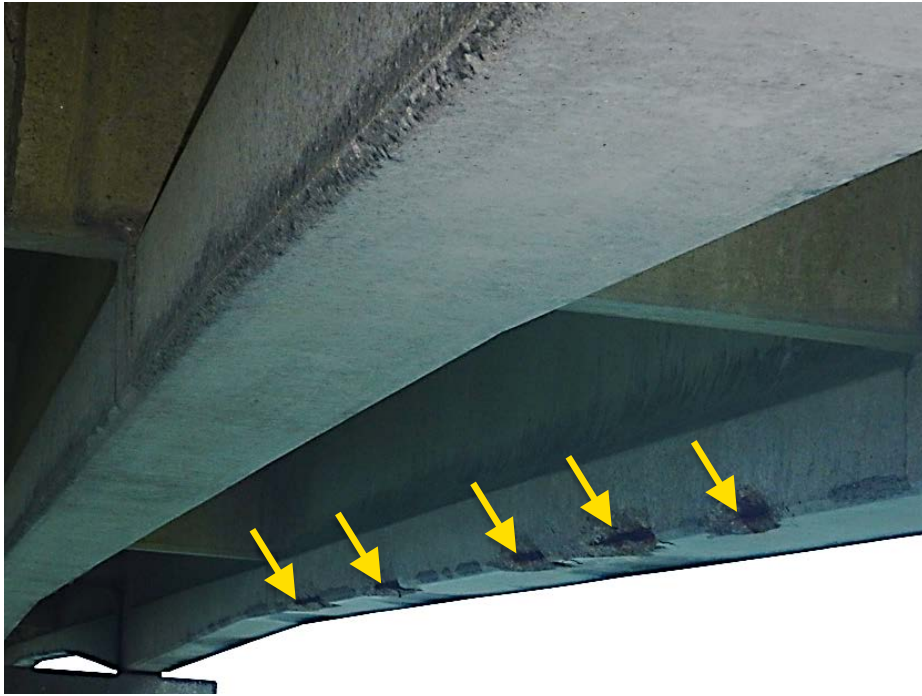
BNB157 Girder 1 - Spall with 1 Exposed Prestressing Strand, 5 Locations (Looking Northeast)
